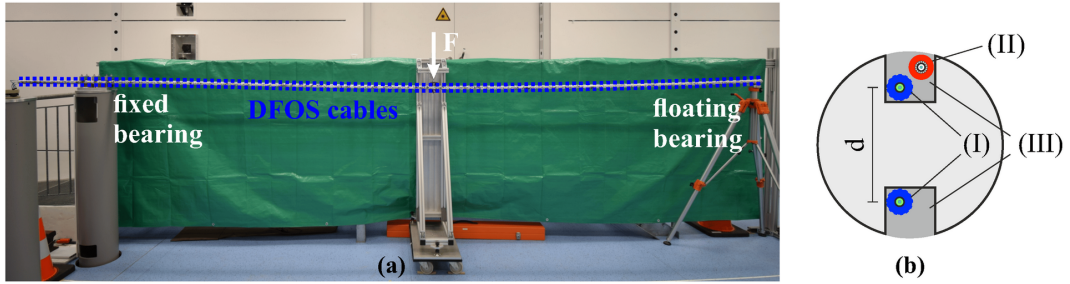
Figure source from [9] : "Laboratory testing of steel rod specimen performed by [5] : (a) Practical test setup. (b) Installation scheme with (I) extended-range cable, (II) temperature sensing cable, and (III) gluing groove." This figure shows the typical application of FOSS in structural-health monitoring, specifically the extended sensing length, use of Distributed Fiber Optic Sensors (DFOS), the embedding into solid structures, and necessary sensitivity to small curvature differentials.
